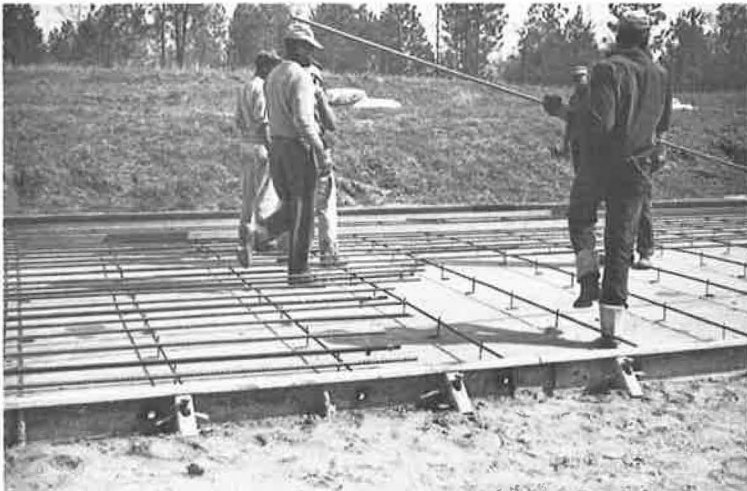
Placement of bar reinforcement in west pavement (Jones County).
